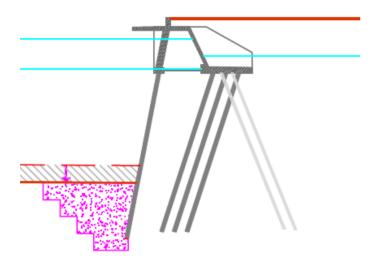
principle cross section of the grout injection at the toe of the structure (Schutte, Inventory and preselection, 2017)
